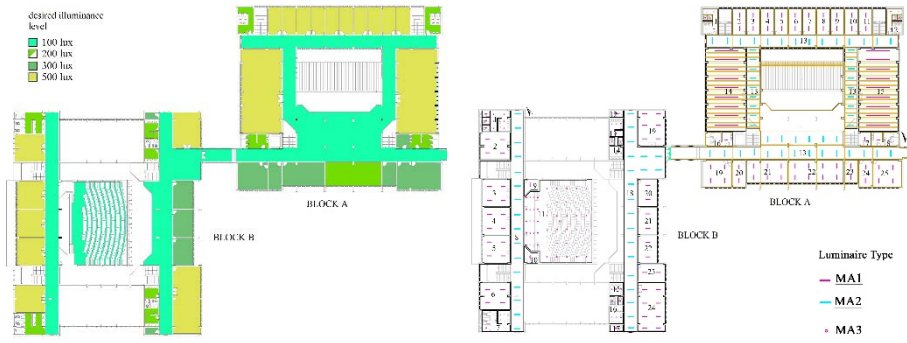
First Floor Plan and Existing Artificial Lighting Layout
